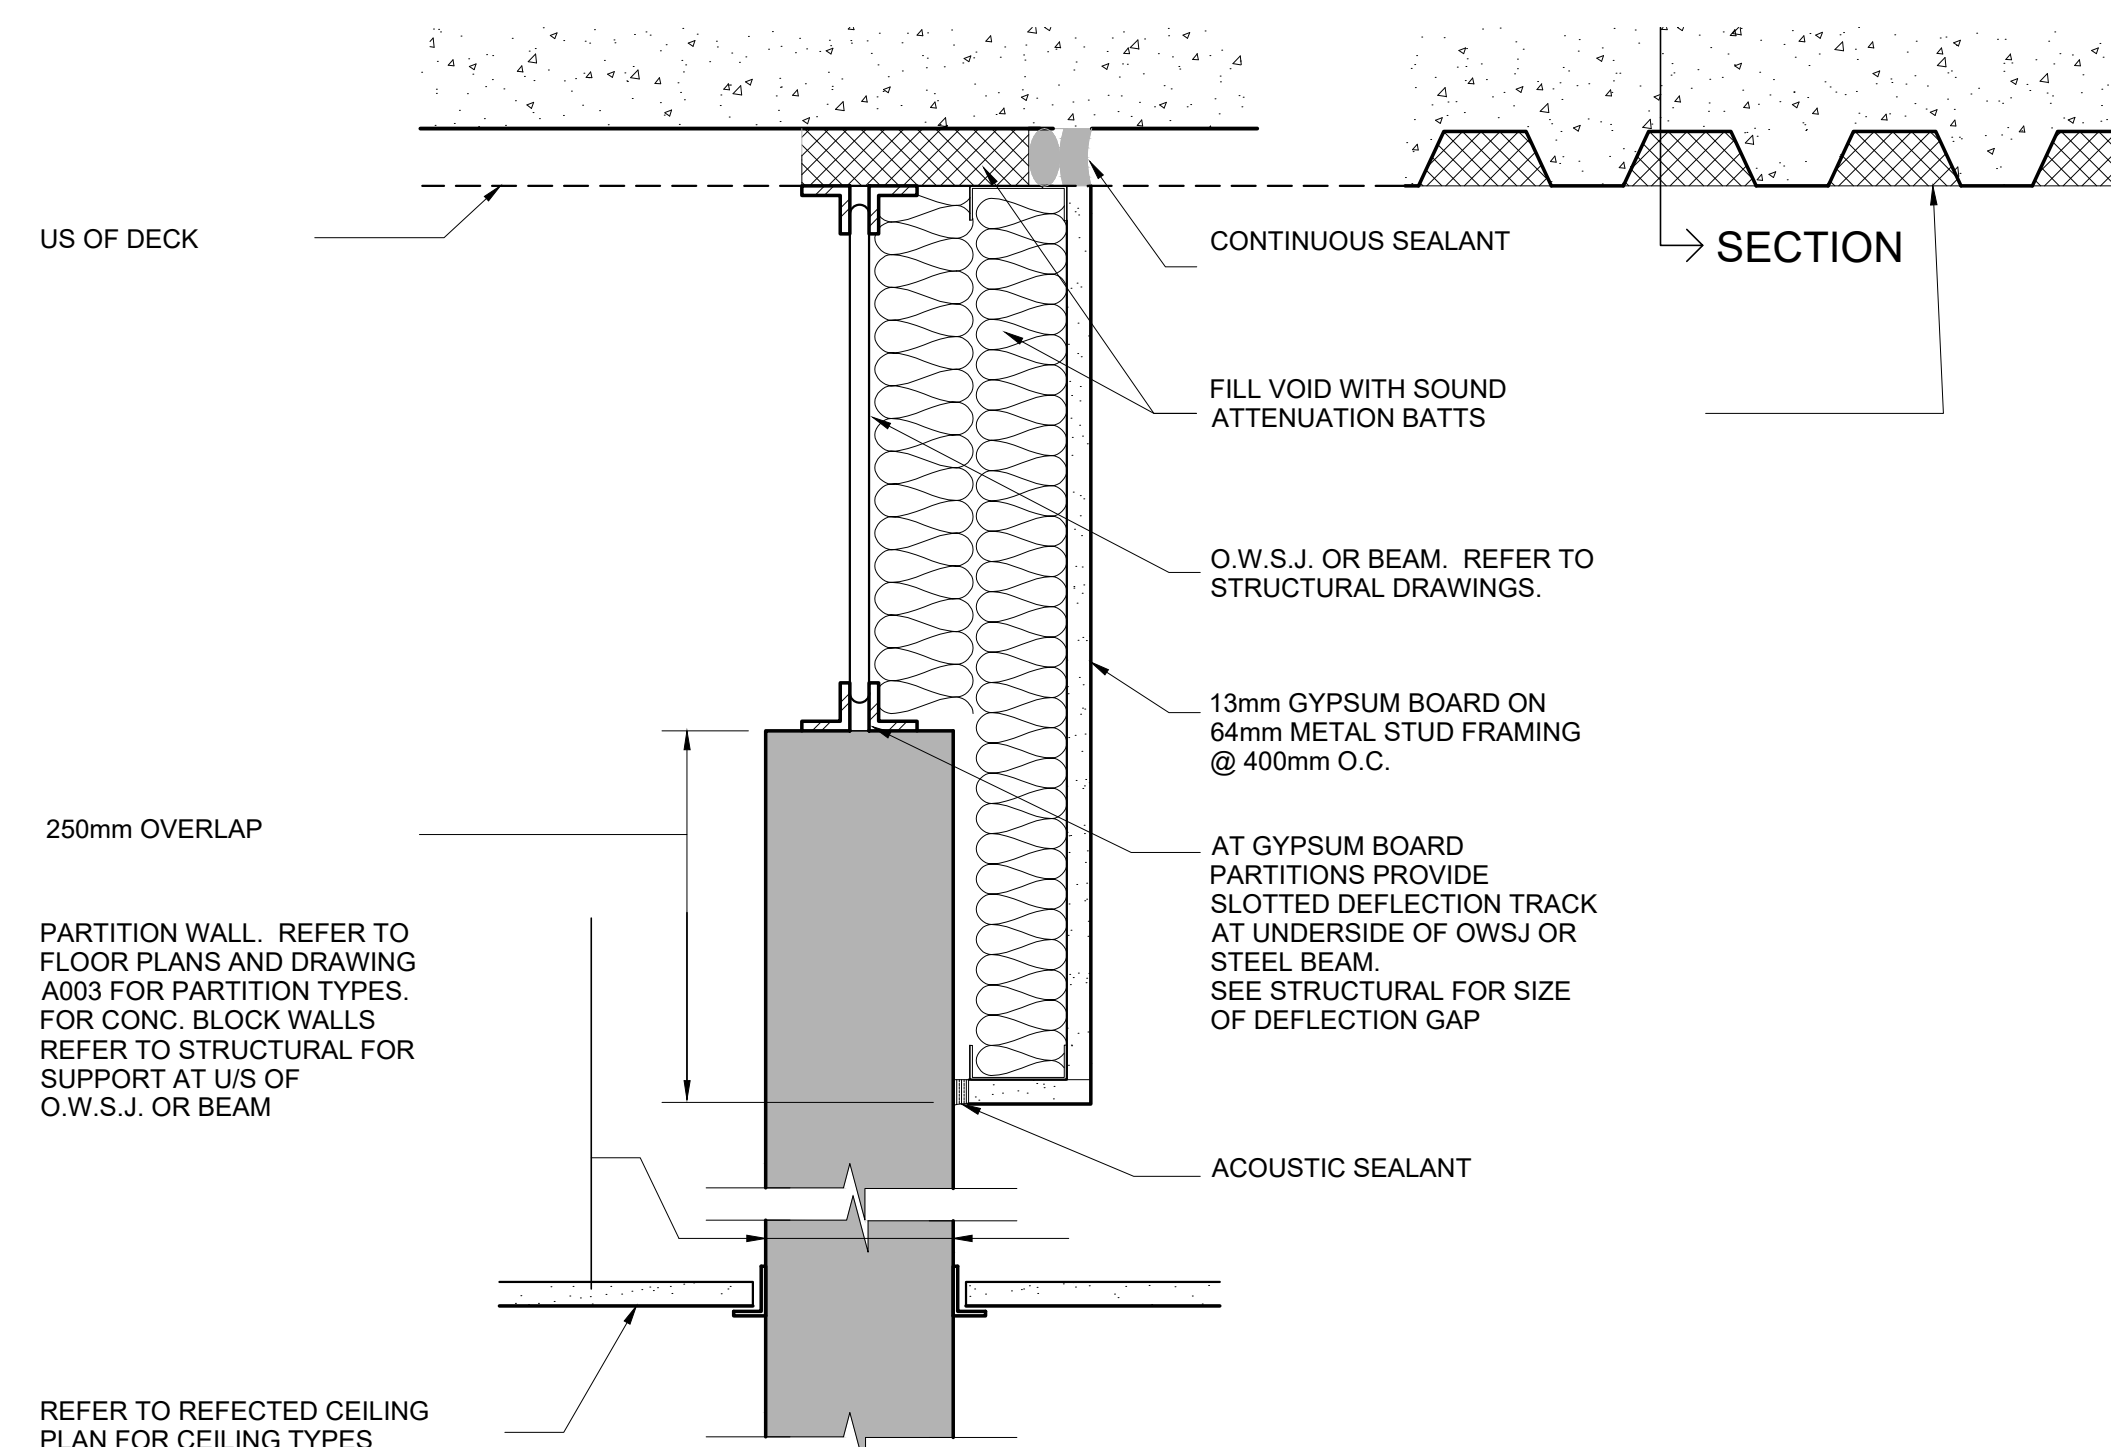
FIGURE F: TYPICAL NON-RATED WALL PARTITION AT UNDERSIDE OF O.W.S.J. OR STEEL BEAM
